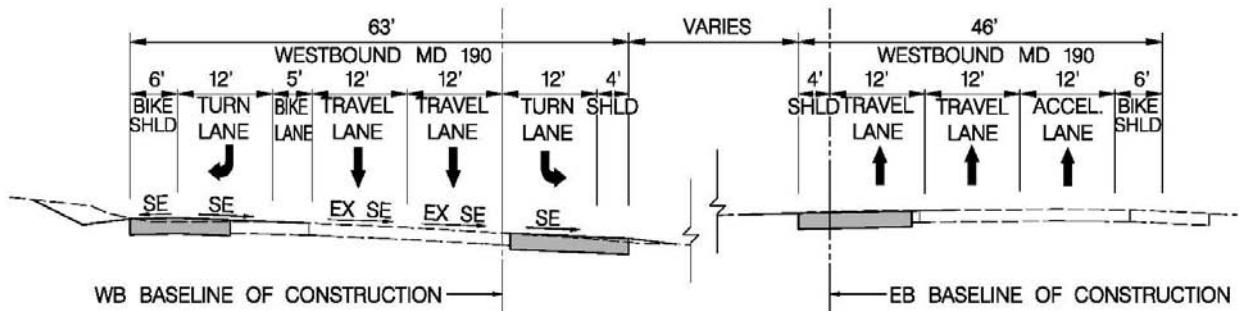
Alternative 2 - MD 190 Intersection East of Pyle Road
